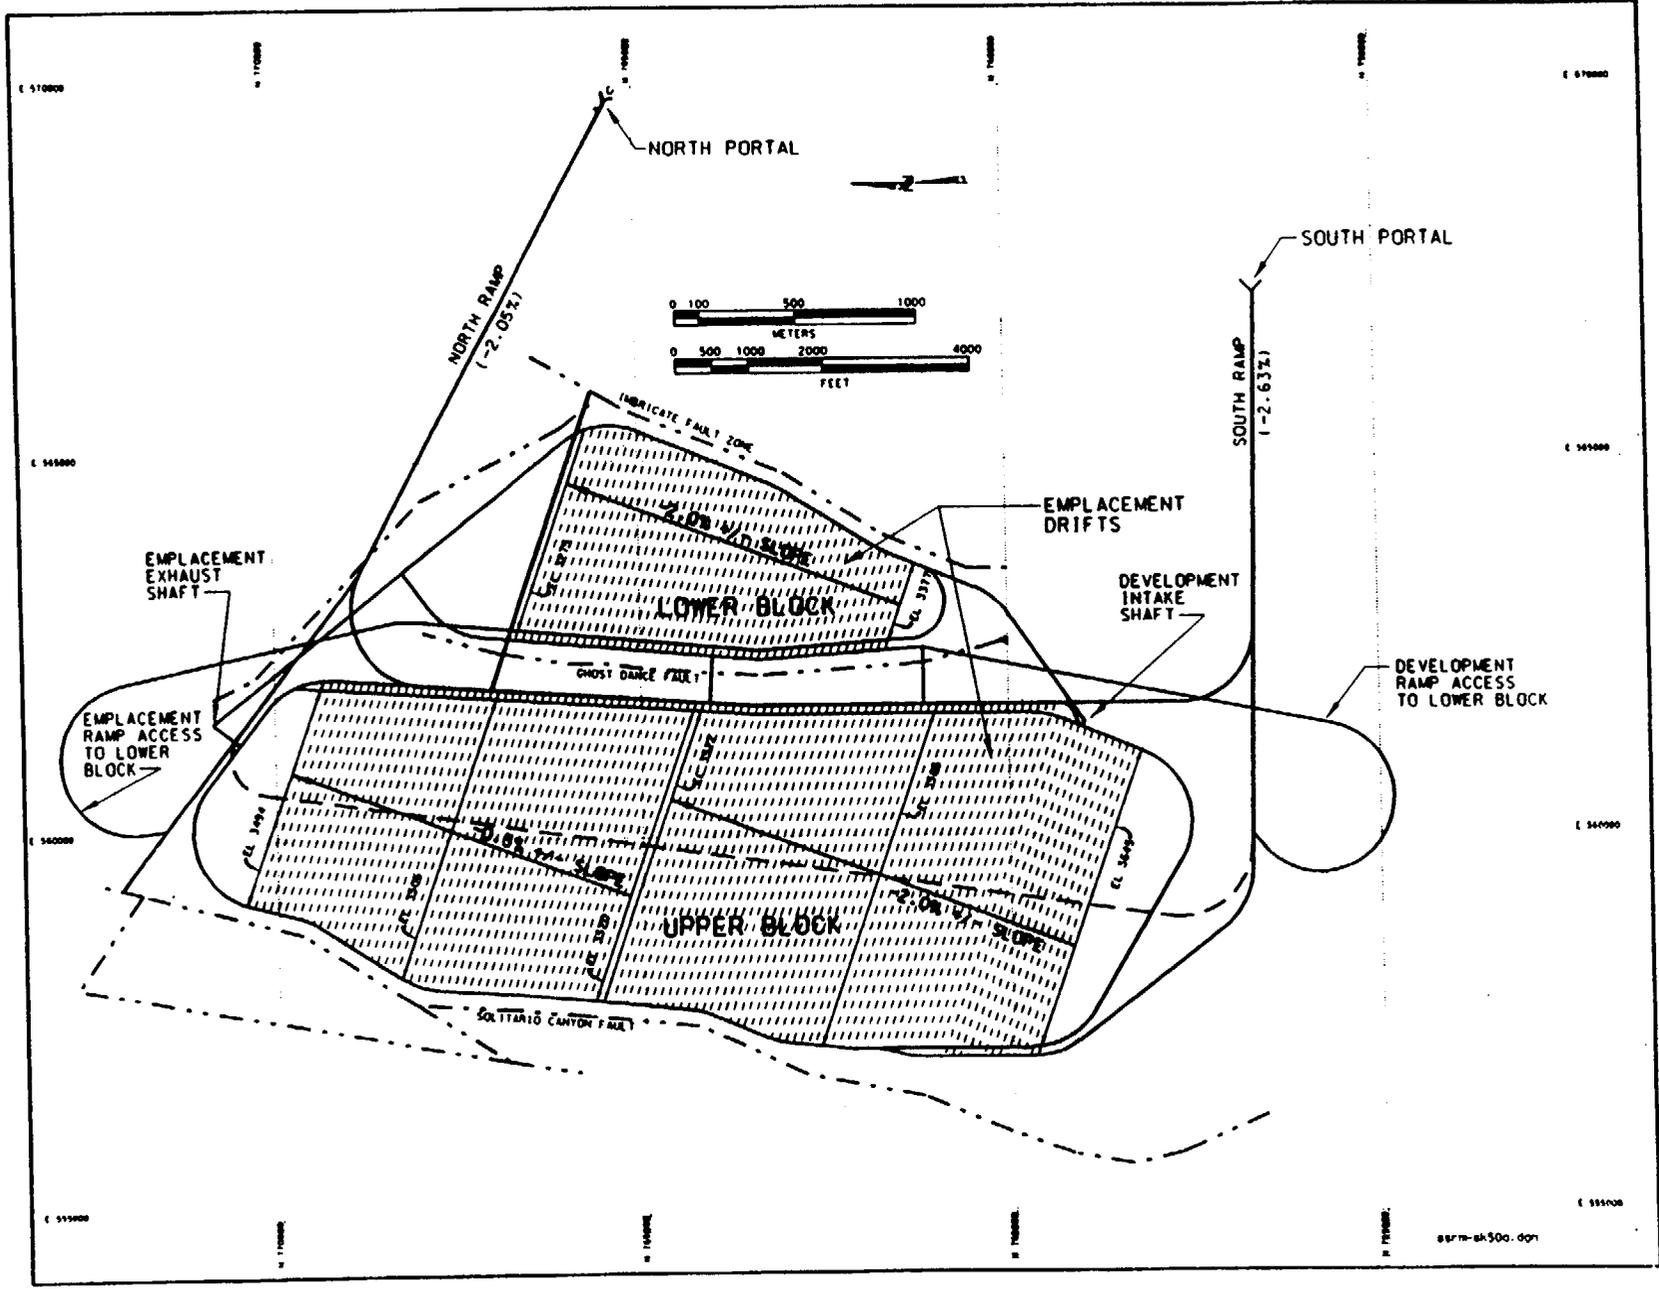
Elevation and Grade Data - Expanded Option I Layout
